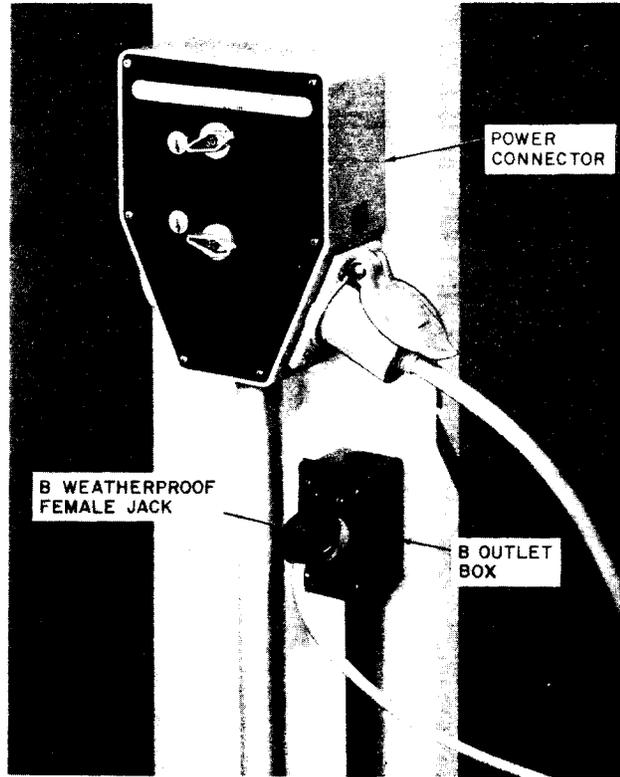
B Weatherproof Female Jack on B Outlet Box Mounted on Post at Dock—Typical Installation
